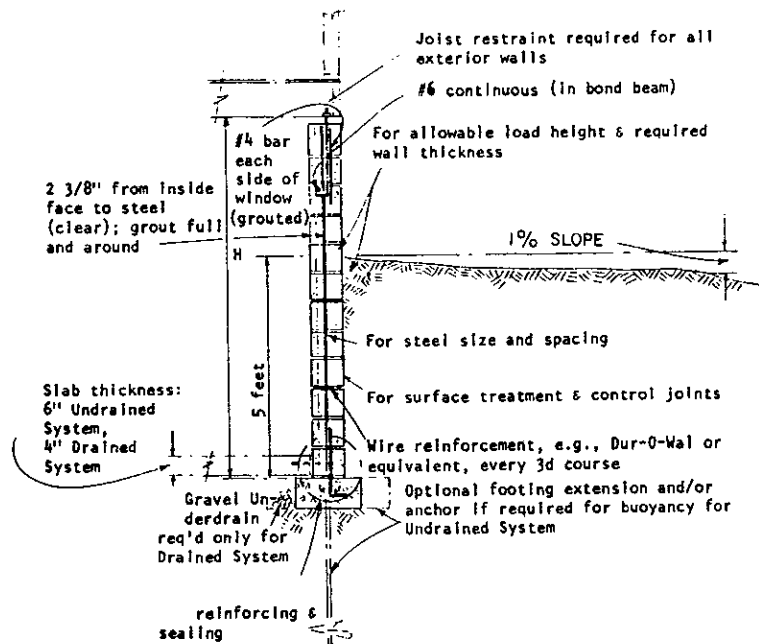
Reinforced masonry block wall design. (Reference 26).
